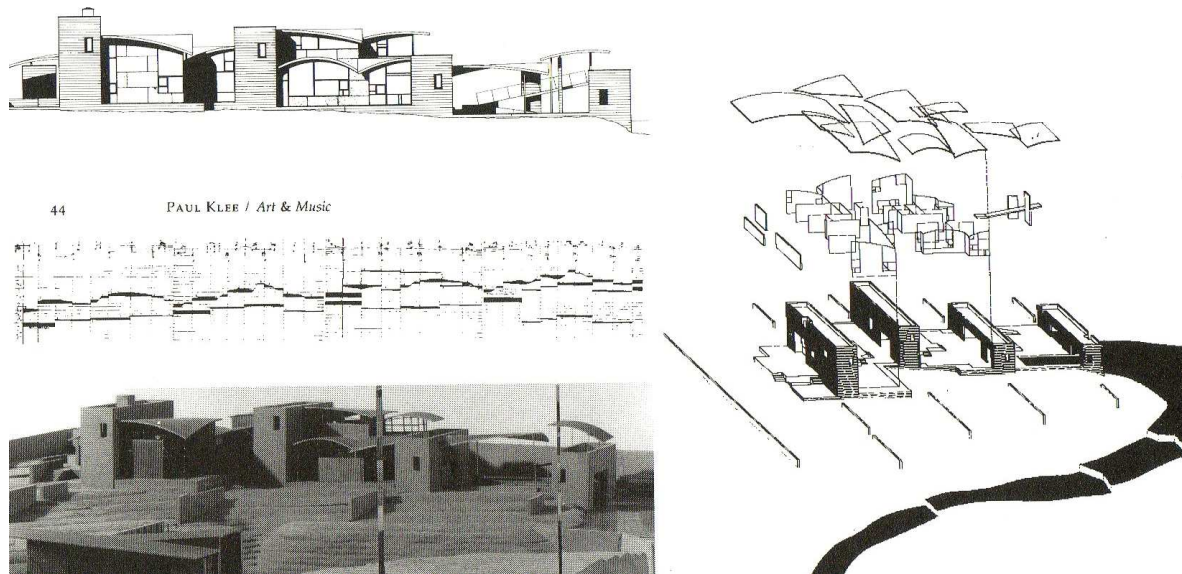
Image III.ii: Sketches for Steven Holl's *Stretto House* ⁷
